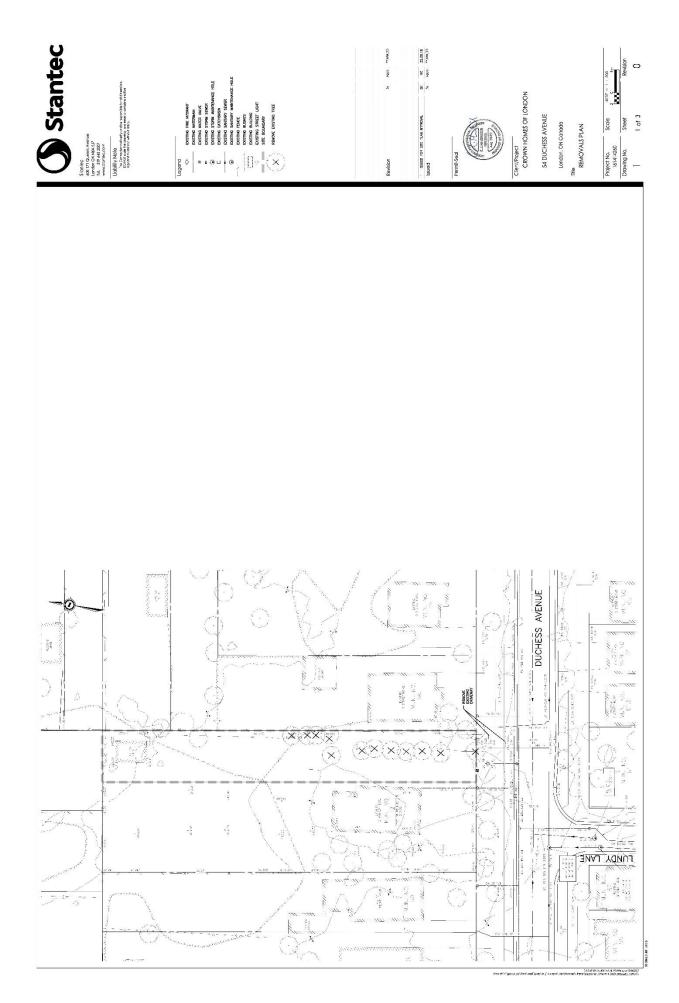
Site Plan submitted with the Heritage Alteration Permit application for 54 Duchess Avenue, showing the tree removals required to accommodate the proposed new building.
